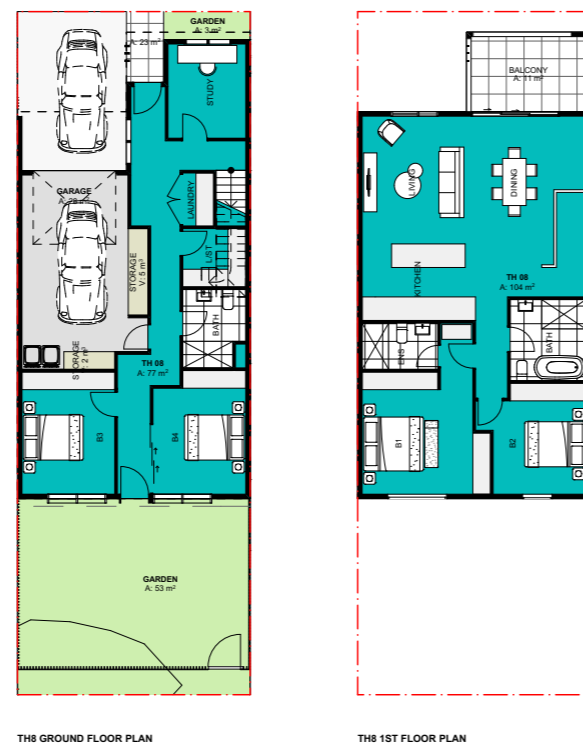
Townhouse Type 8 (Source: Plus Architecture)
